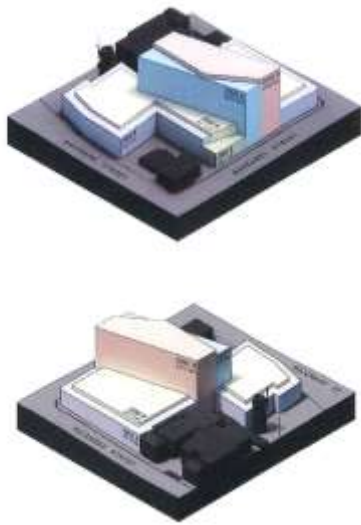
Proposed building envelope (LCC 2021) and Figure 2: Proposed building envelop in context of the surrounding area and building heights (Ireneinc Planning and Urban Design 2020).
